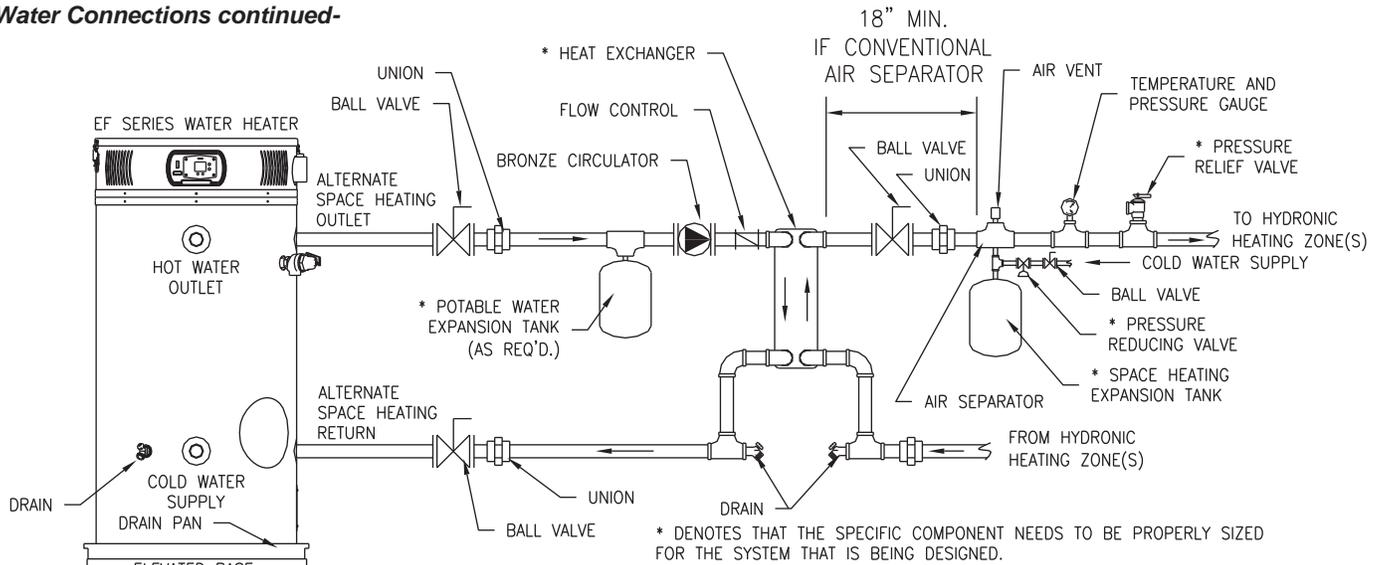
Typical Plumbing Schematic for Zoned Heating
